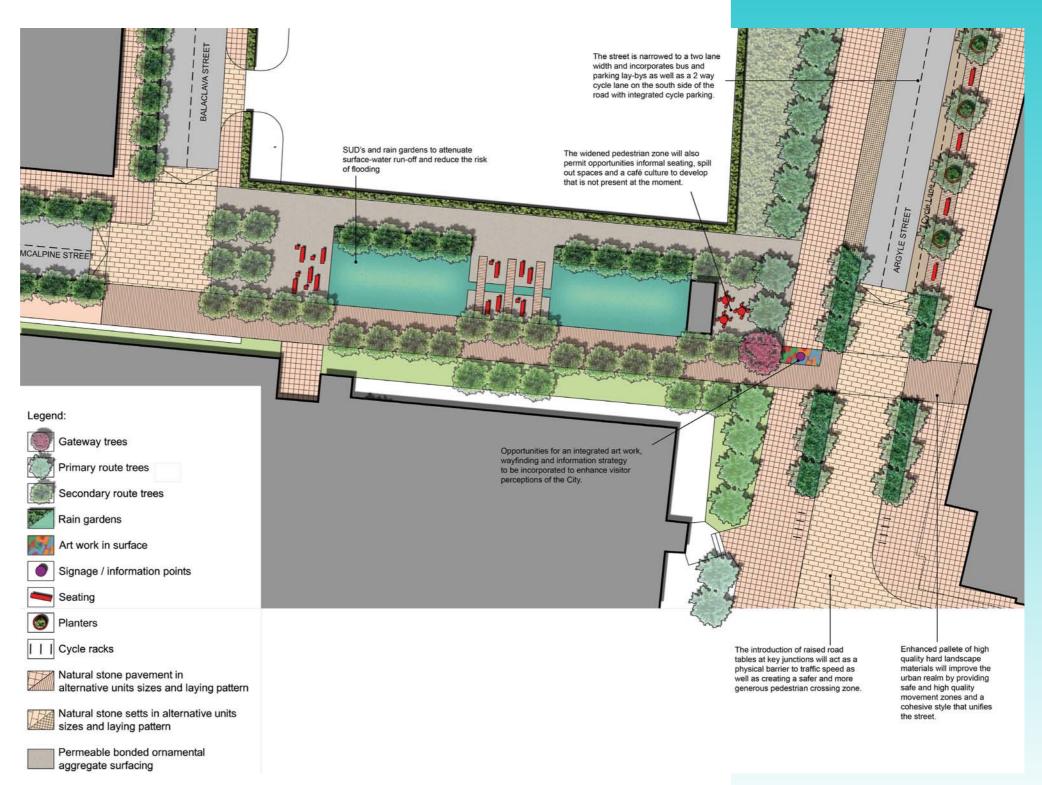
Plan showing rainwater gardens and the greening of Argyle Street (TGP Landscape Architects 2014)
